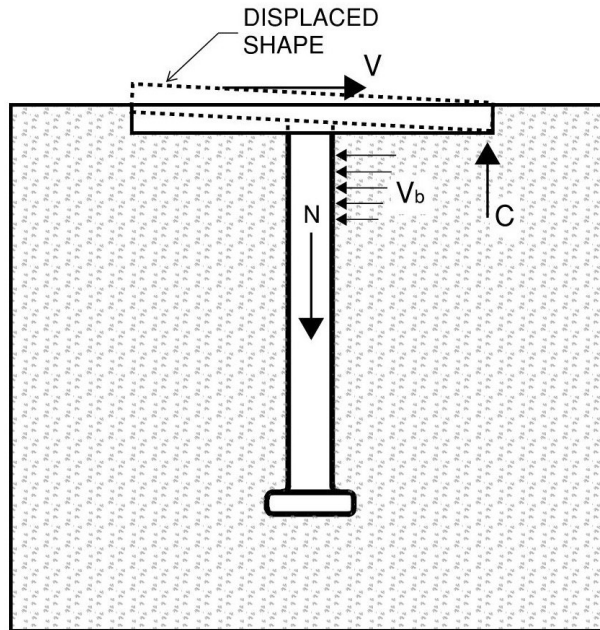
Reaction forces of headed anchor subjected to shear loading
